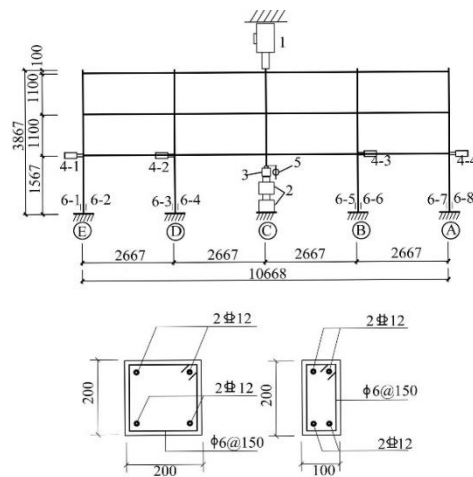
Test equipment and instrument layout. 1. Hydraulic actuator; 2. Two jacks connected in series; 3. Force sensor; 4. Motion detector 4-1~4-4; 5. Dial indicator; 6. Concrete strain gauge 6-1~6-8.
